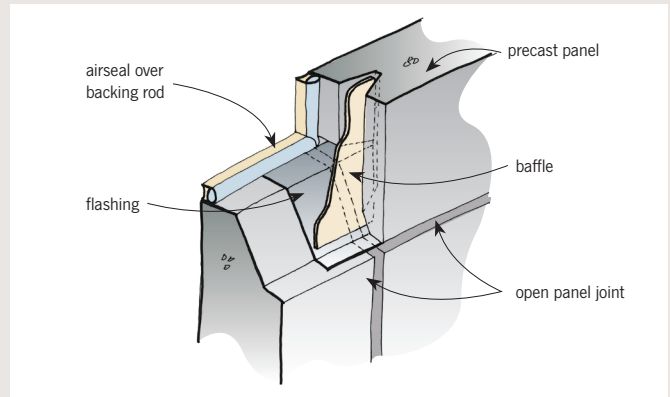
Schematic of an open drained joint detail that allows movement in precast panels.
